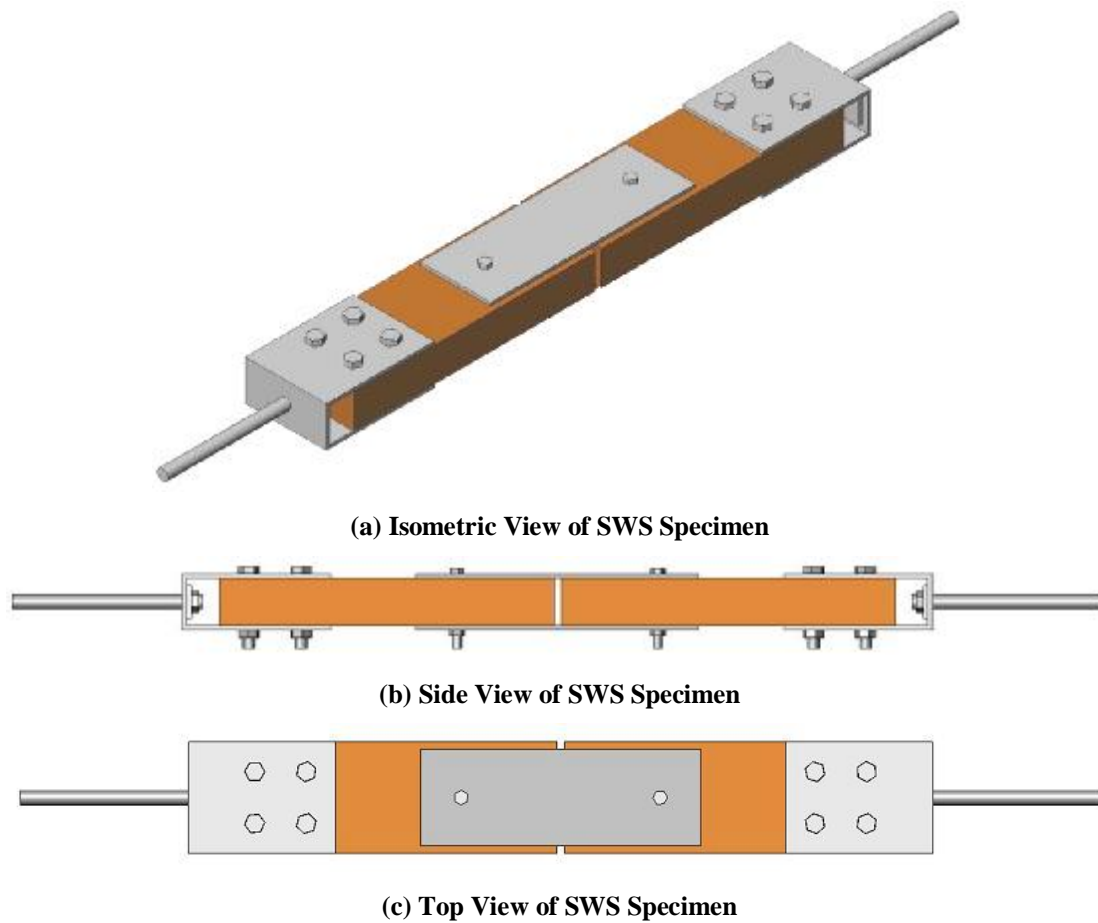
Schematic diagram of isometric view of SWS specimen assembly.
